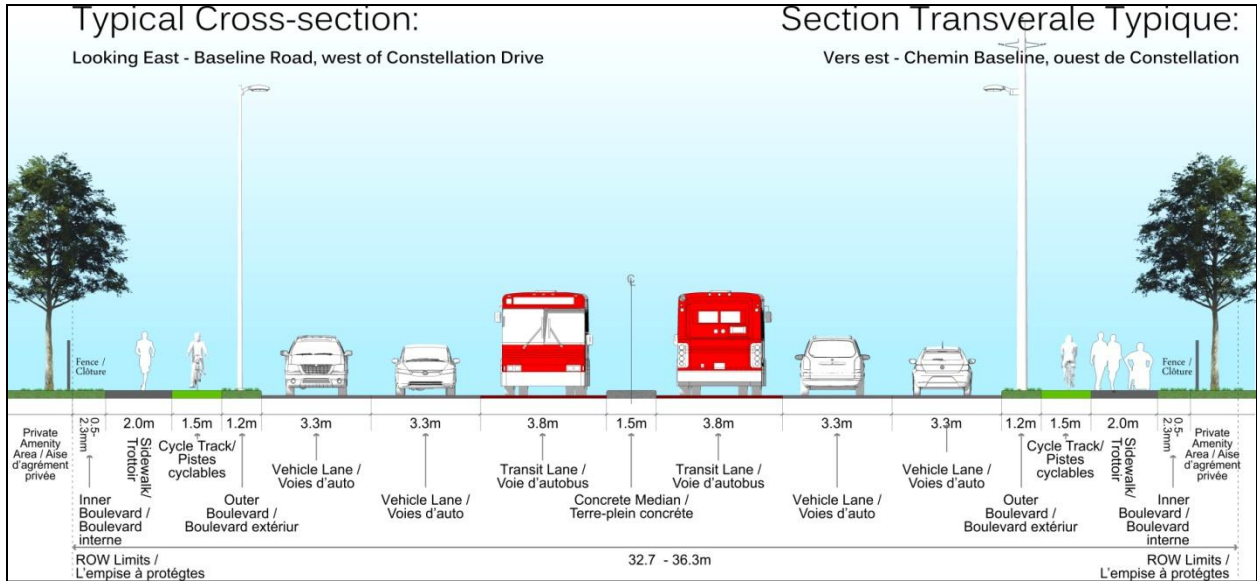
Typical cross-section - Baseline Road, West of Constellation Drive
